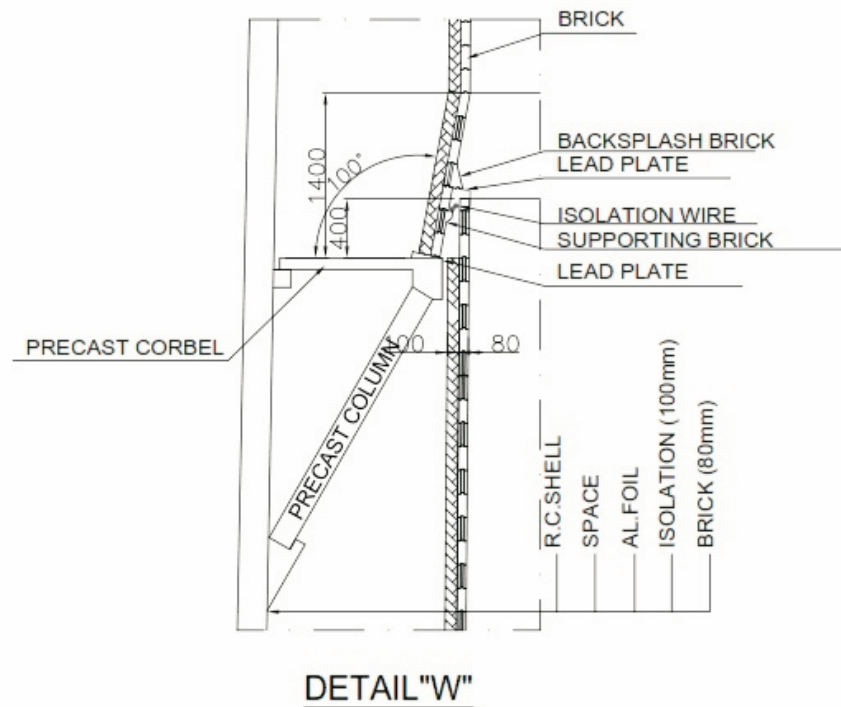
Typical Cross Section of the Chimney (ENDEM Co).
